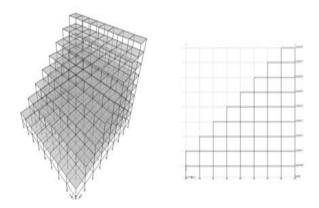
3-D View and Elevation of Setback building for Storey $8(0^{\circ}$ Slope)
